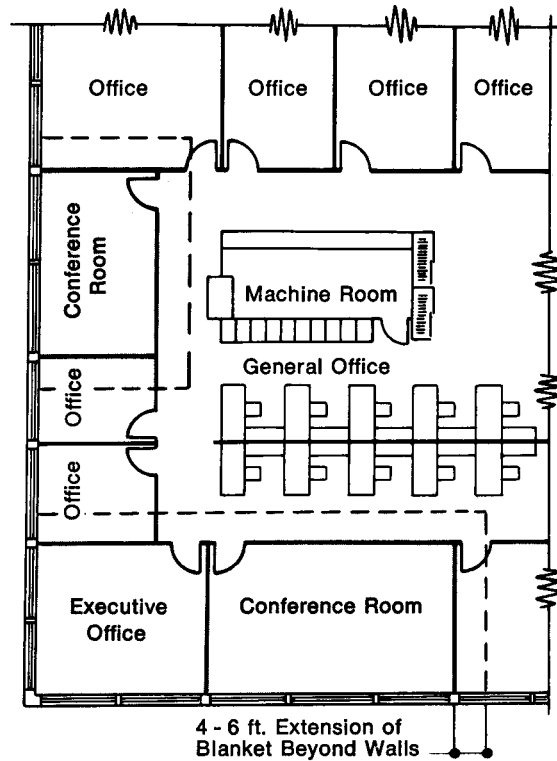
Ceiling Blanket Installations (tinted areas)
